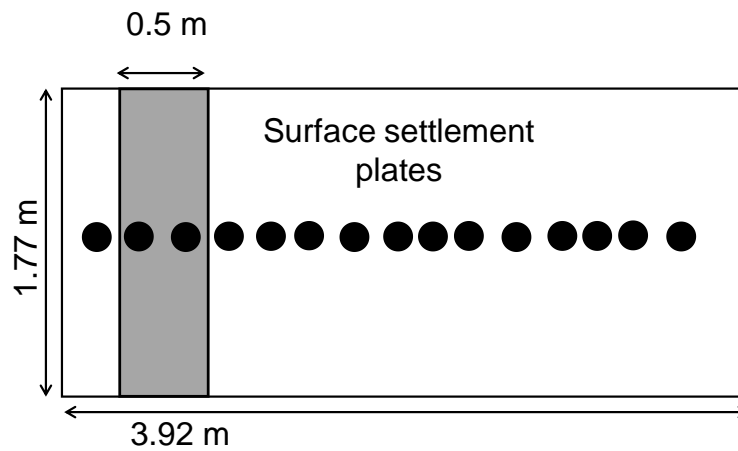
Example of instrumentation layout for inclined loading of footings: Plan
